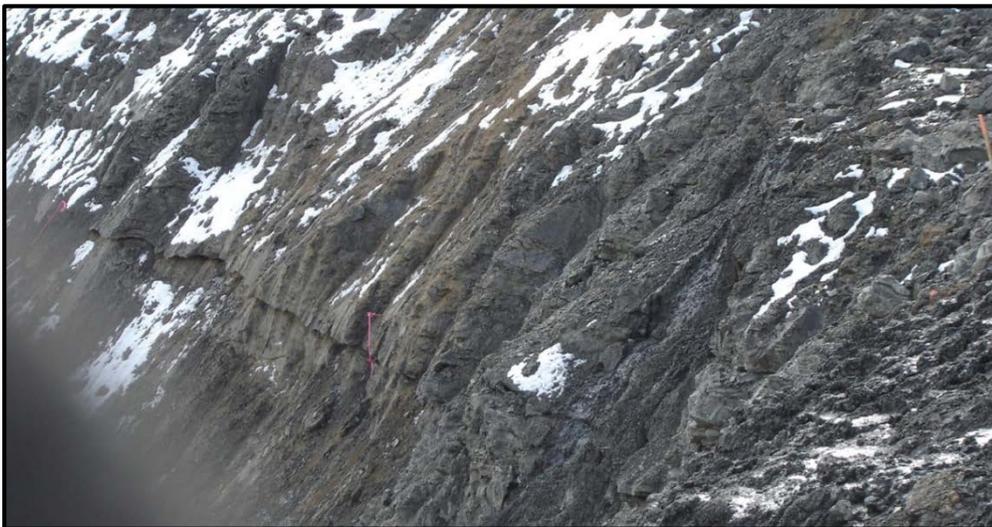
Movement along failure plane in overburden, south wall, Main pit, Stage 3 pushback, April 2009.
